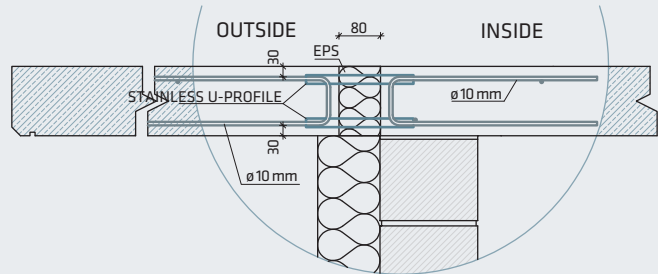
Cantilevered balcony slab with TKM G-G rib
